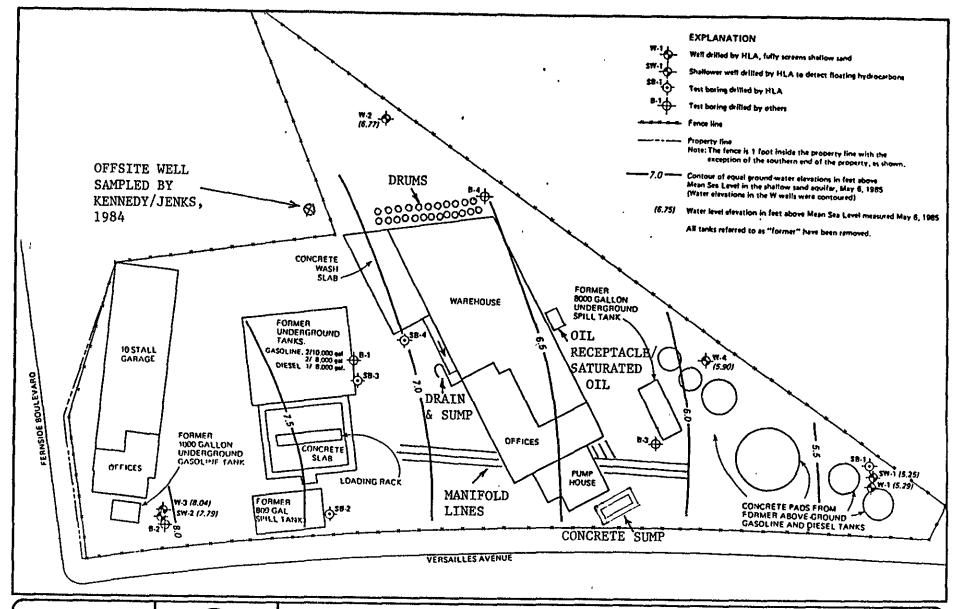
SITE PLAN SHOWING PREVIOUS EXPLORATORY DRILLING LOCATIONS AND HISTORICAL PETROLEUM BALK STROAGE FACILITIES
